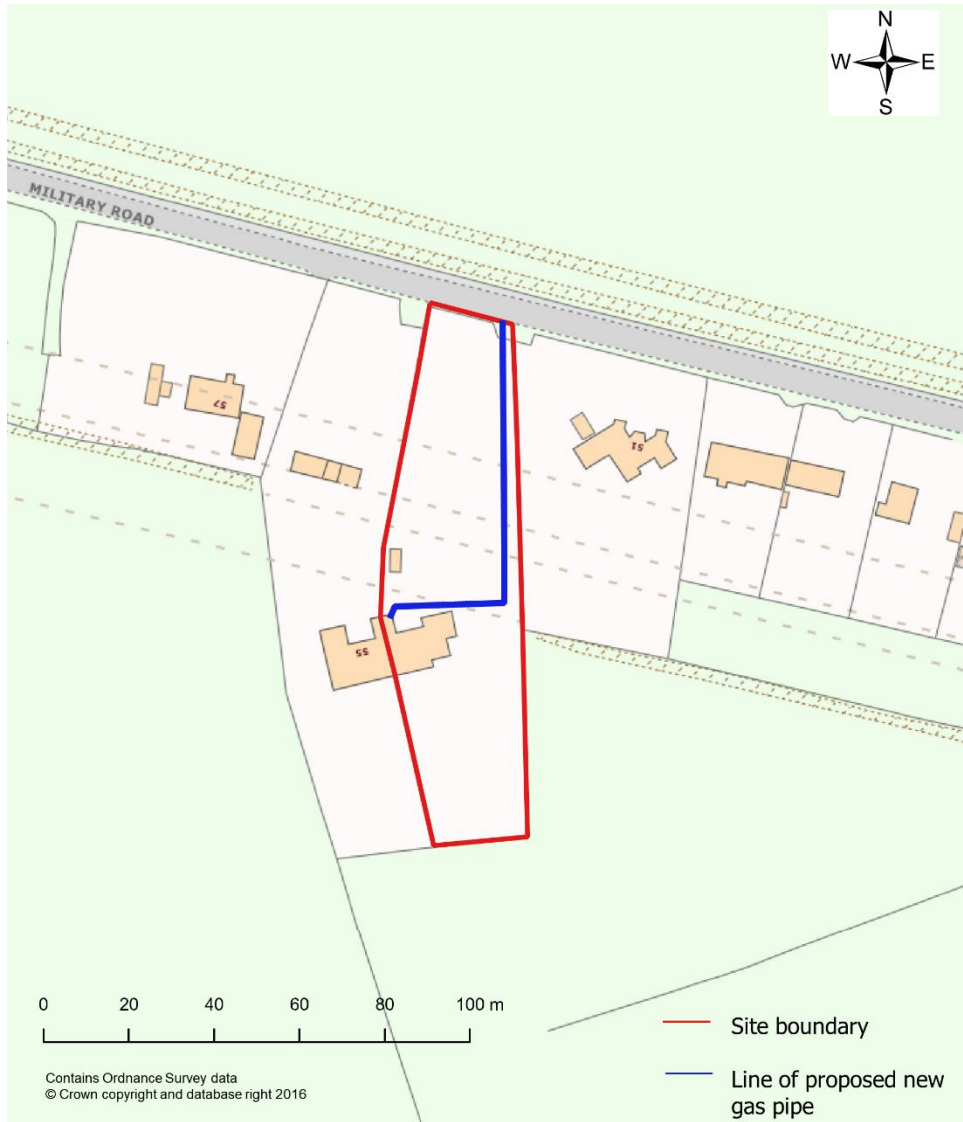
Site location plan showing red line site boundary and line of proposed new gas pipe
